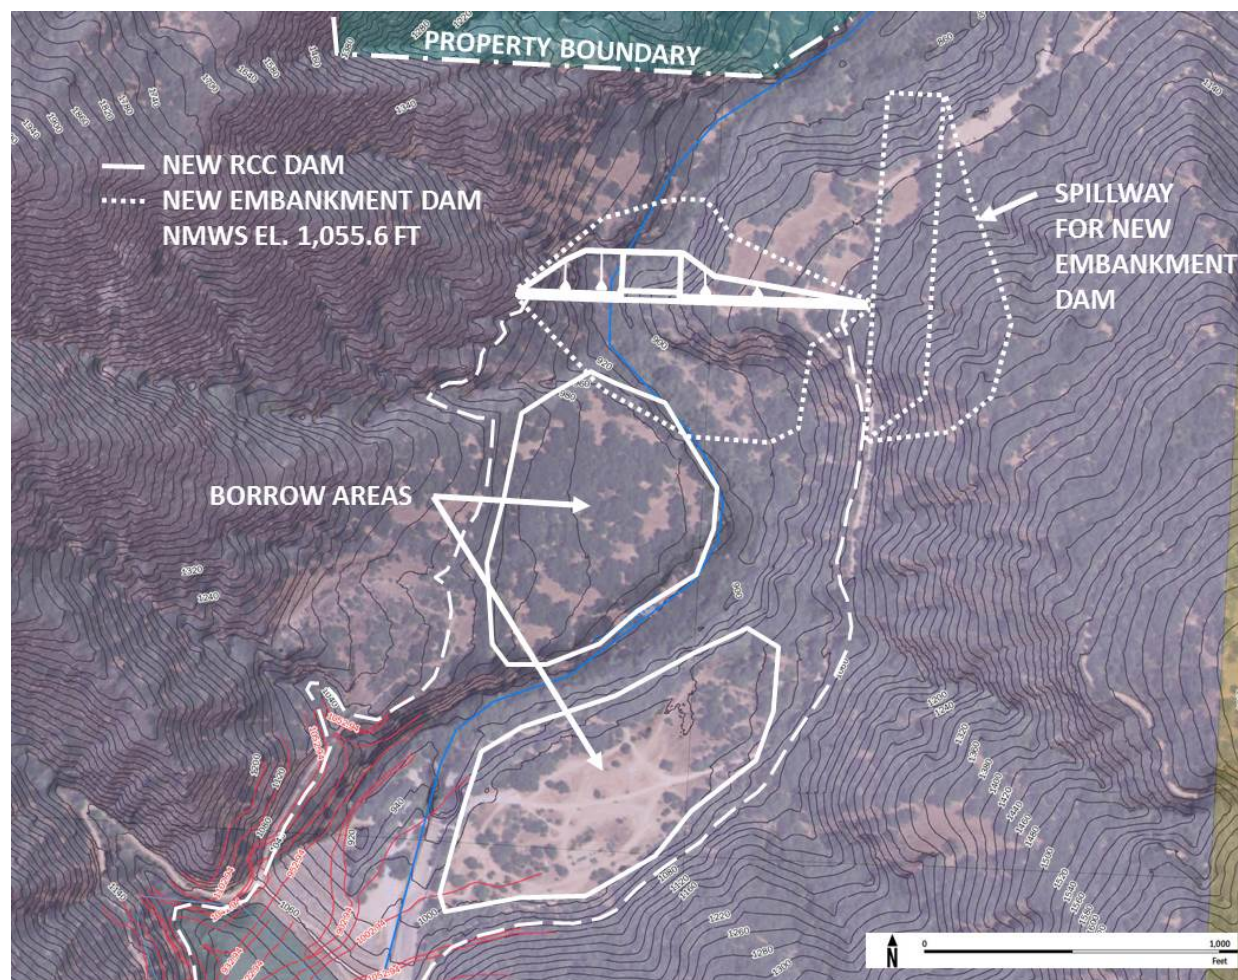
Alternative 4c New Downstream Dam Concept Plan
